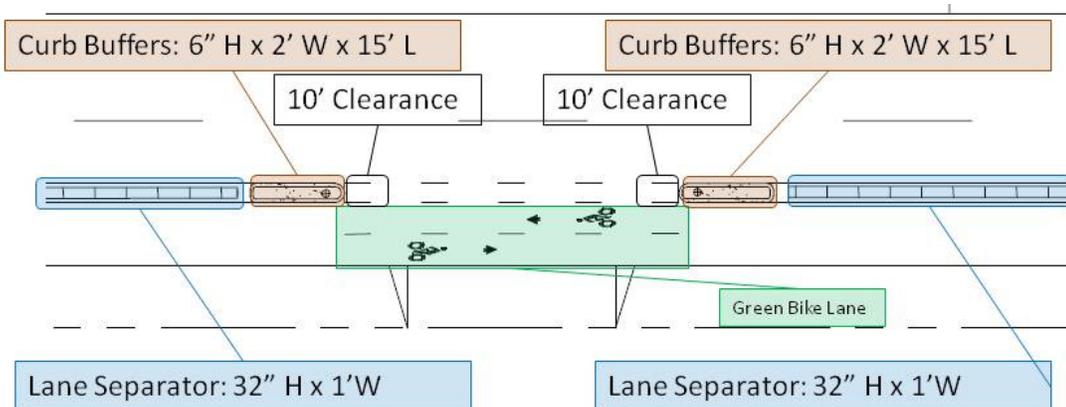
40 foot opening in barrier. Access to Sandpointer driveways will NOT be affected.
